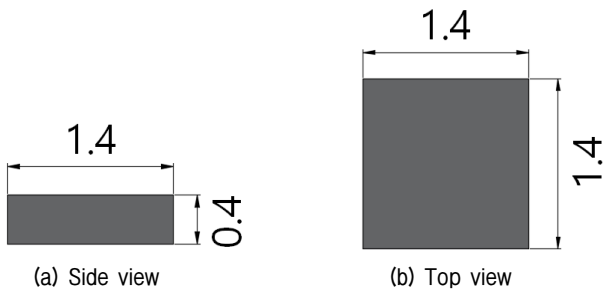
Sectional view of shallow foundation (prototype scale, dimension: m)
